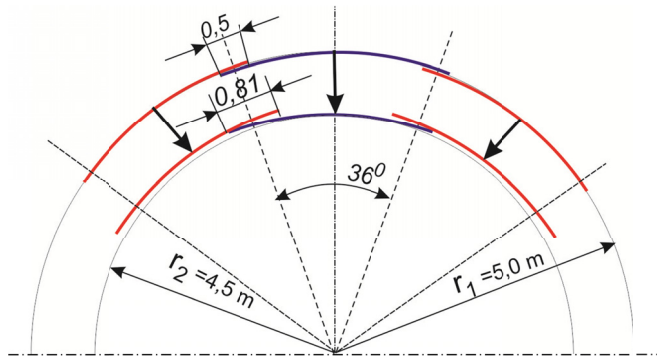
Mechanism illustrating the formation of stress on stirrups in an steel arch lining of the SW-4 shaft (author's work)
